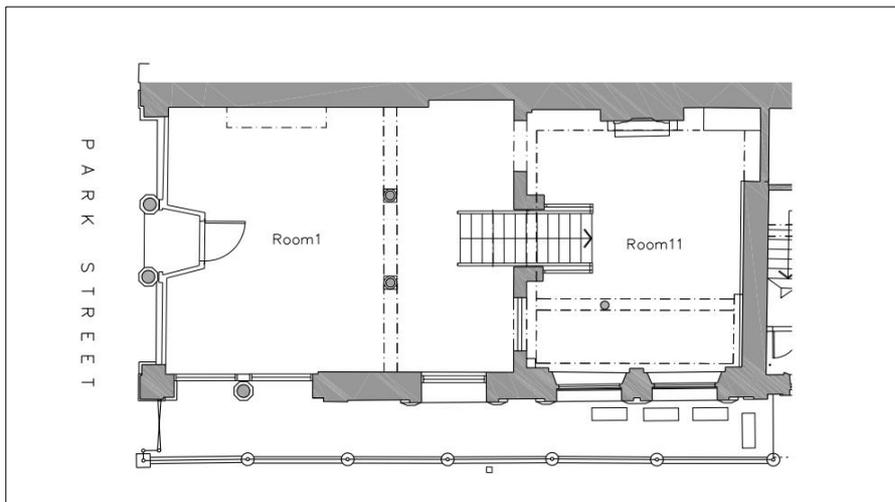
Upper Ground Floor Plan Source W H Architects Limited.
